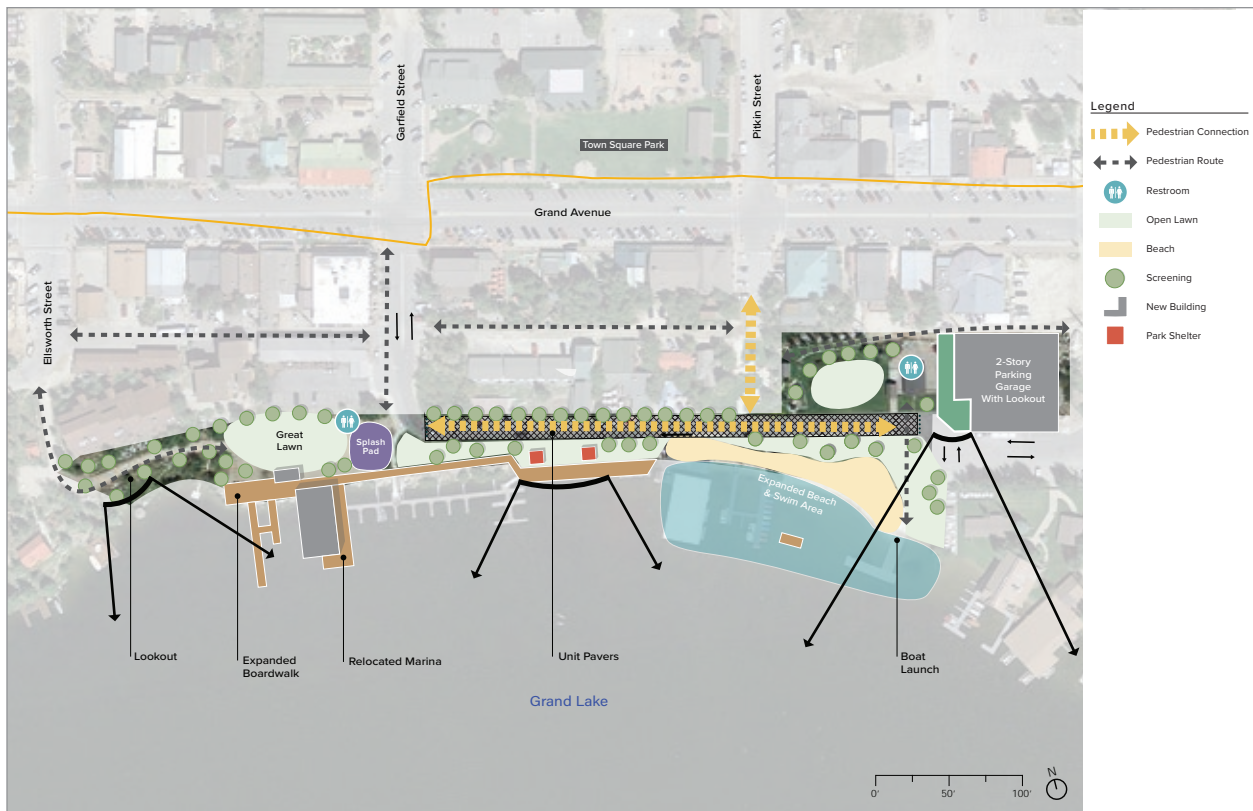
Preferred Concept: Property 11, 12, and 13 - Lakeside Park, Lake Front Parking Lot and Pioneer Garden Park
